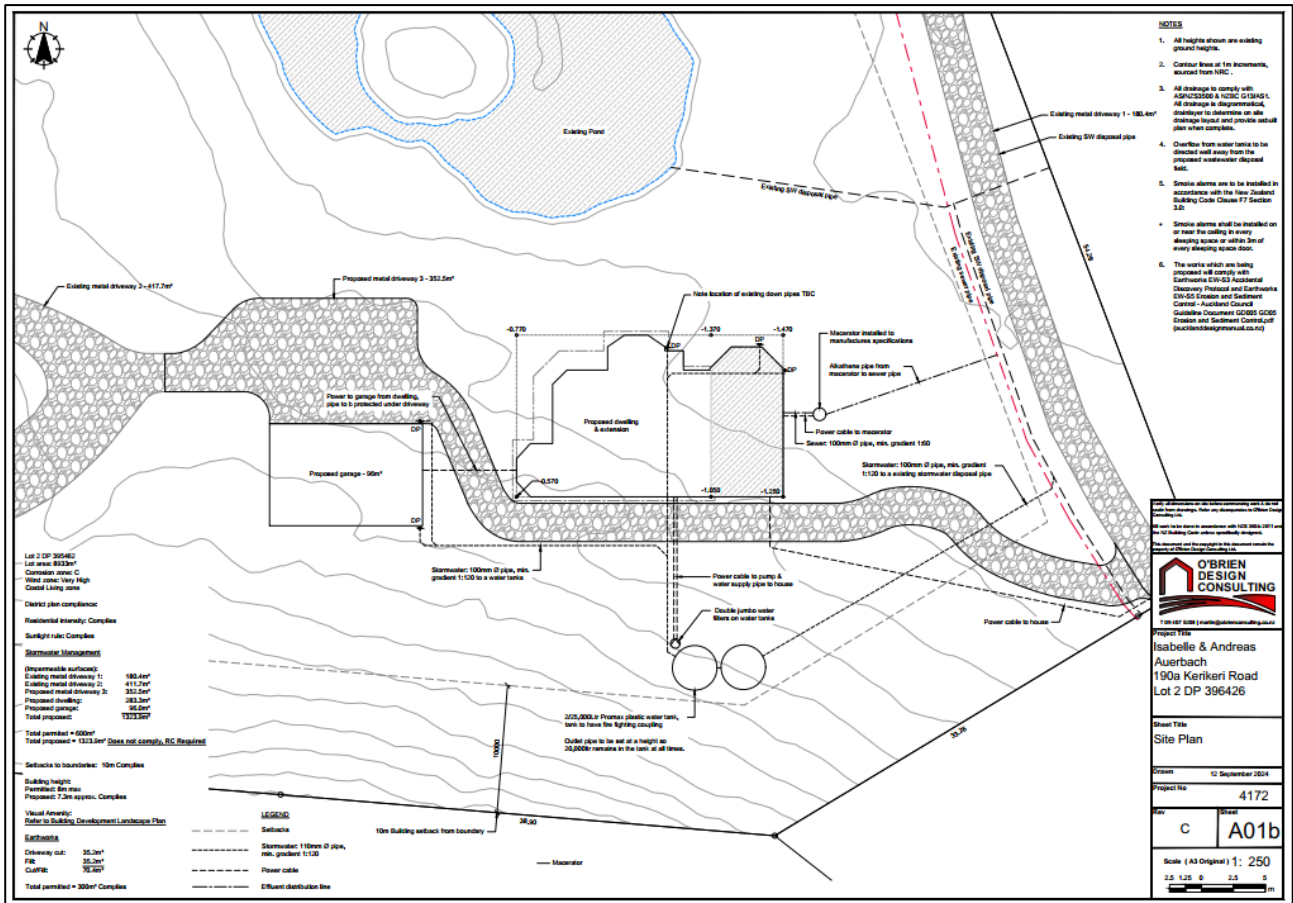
Snip of Proposed Site Plan Provided by O'Brien Design Consulting (Ref No: 4172 Rev C, dated: 12.09.2024)
